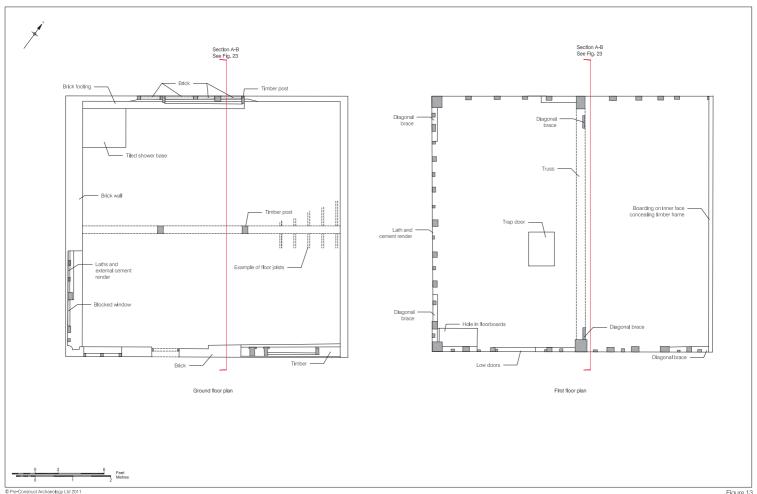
Ground and first floor plans Cottage 4 Musgrove Maltings Baldock 1:50 at A3
